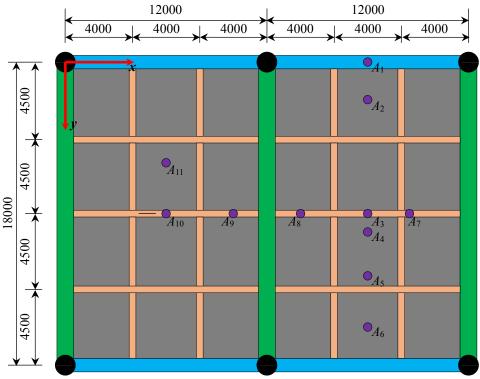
Outline of prestressed concrete floor #3 (all dimensions in mm)
